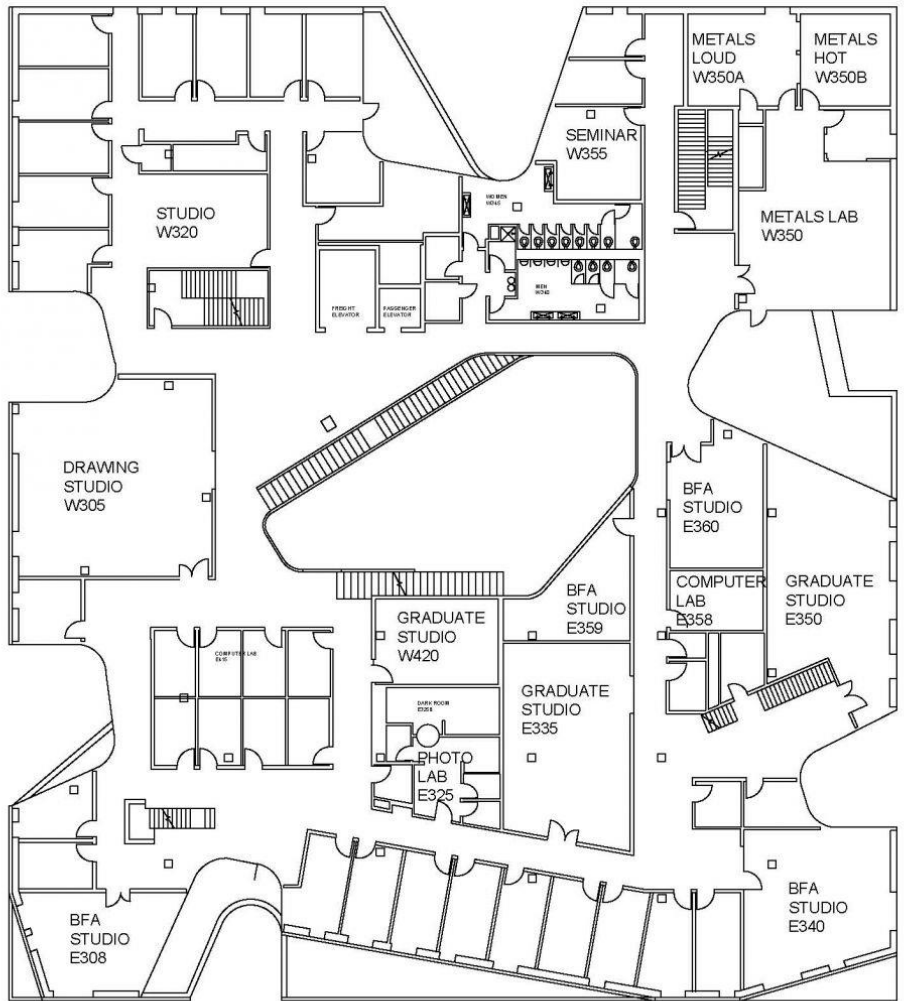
THIRD FLOOR PLAN (CASE STUDY01)
